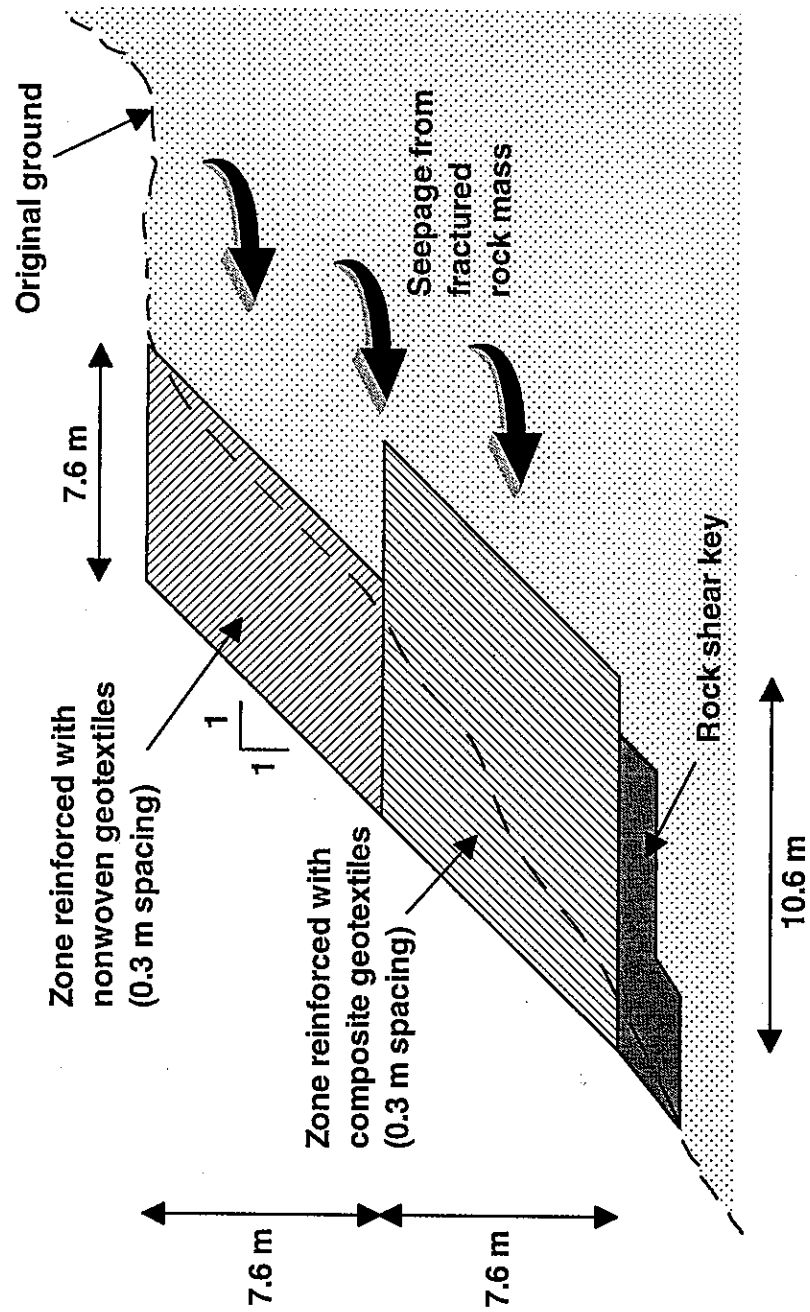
Cross section of the geotextile-reinforced slope (after Zornberg, 1994)
